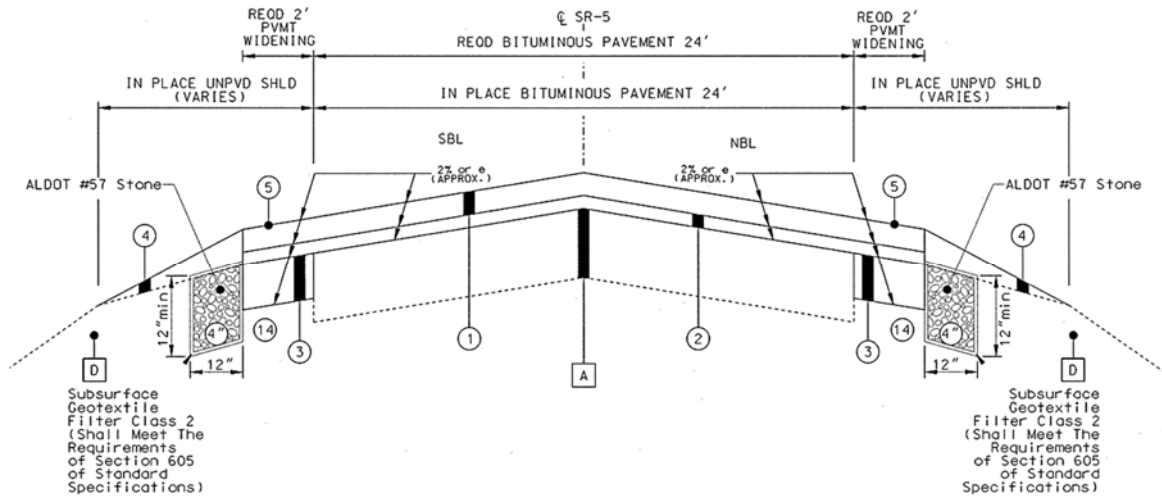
Edge Drain Cross-Section at AL-5 (ALDOT Plans)
